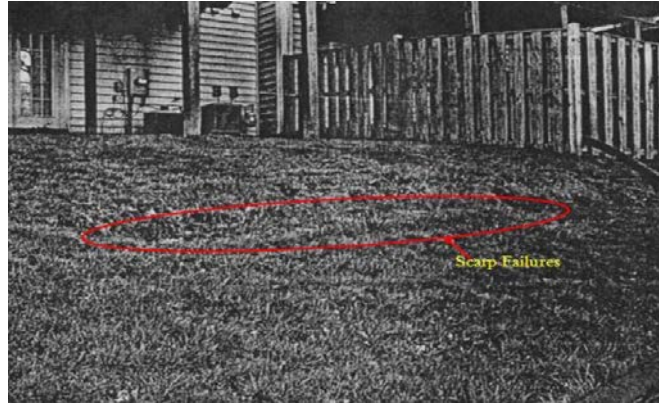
Scarps located at the top of the wall (Mahmood 2009).
